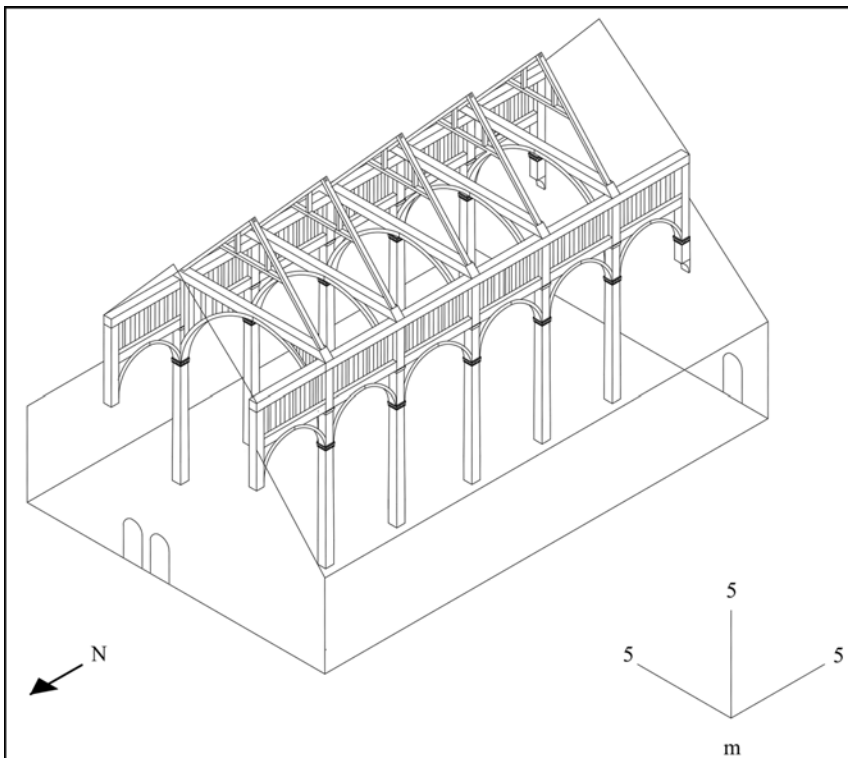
Isometric reconstruction of the aisled hall with clerestory. *Drawing R Buckley.
